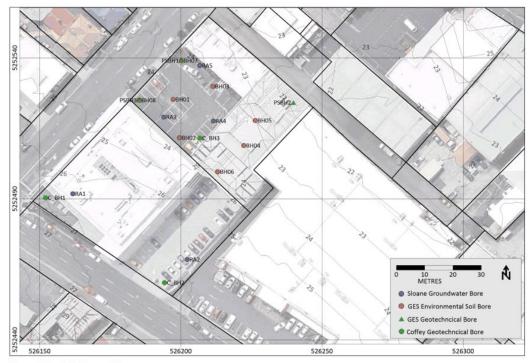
Borehole Layout Plan (Coordinate System: GDA94 MGA Zone 55)
